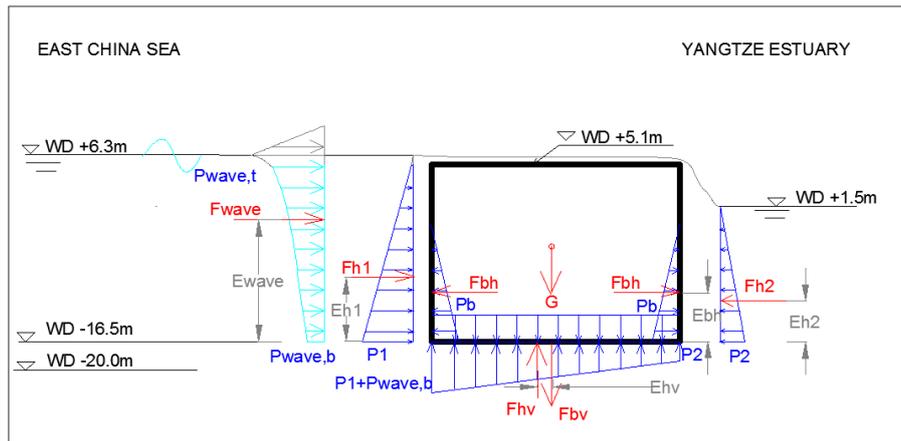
21. Force scheme of immersed gate due to hydraulic forces (storm condition)
